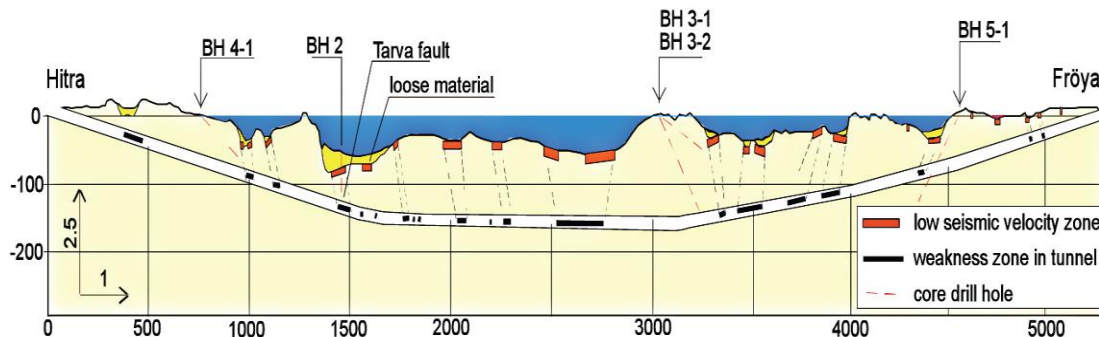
Longitudinal Section of Tunnel Project (source: NFF (2009)).
